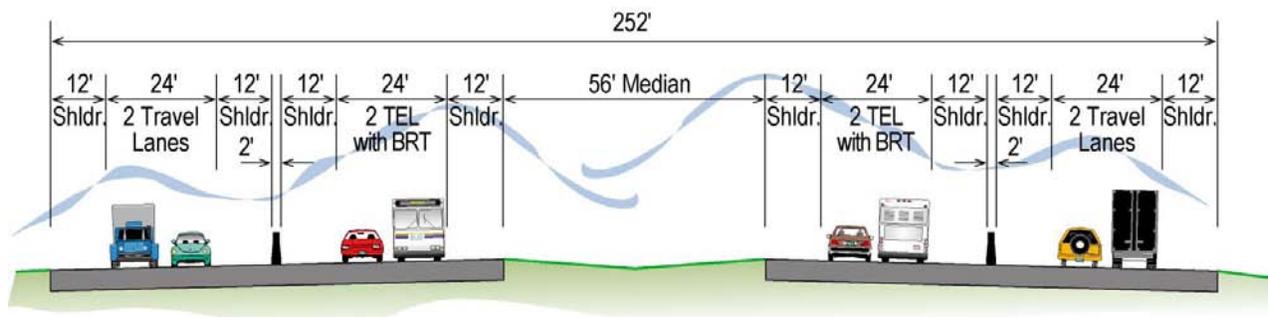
Package B Typical I-25 Cross Section - SH 60 to SH 66
